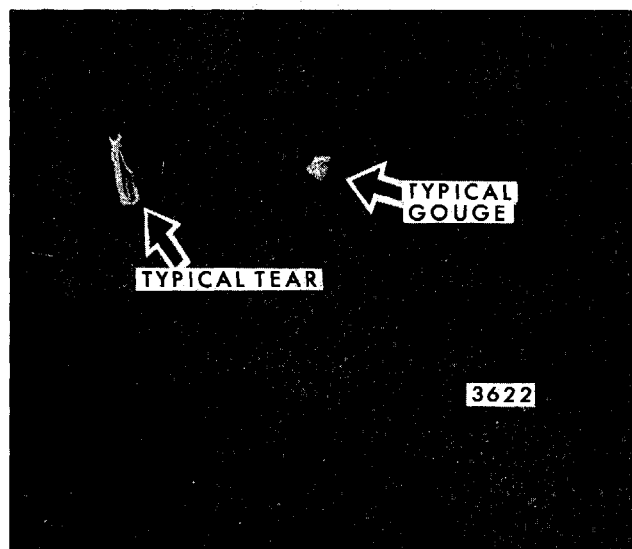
Typical Fabric Roof Cover Discrepancy
